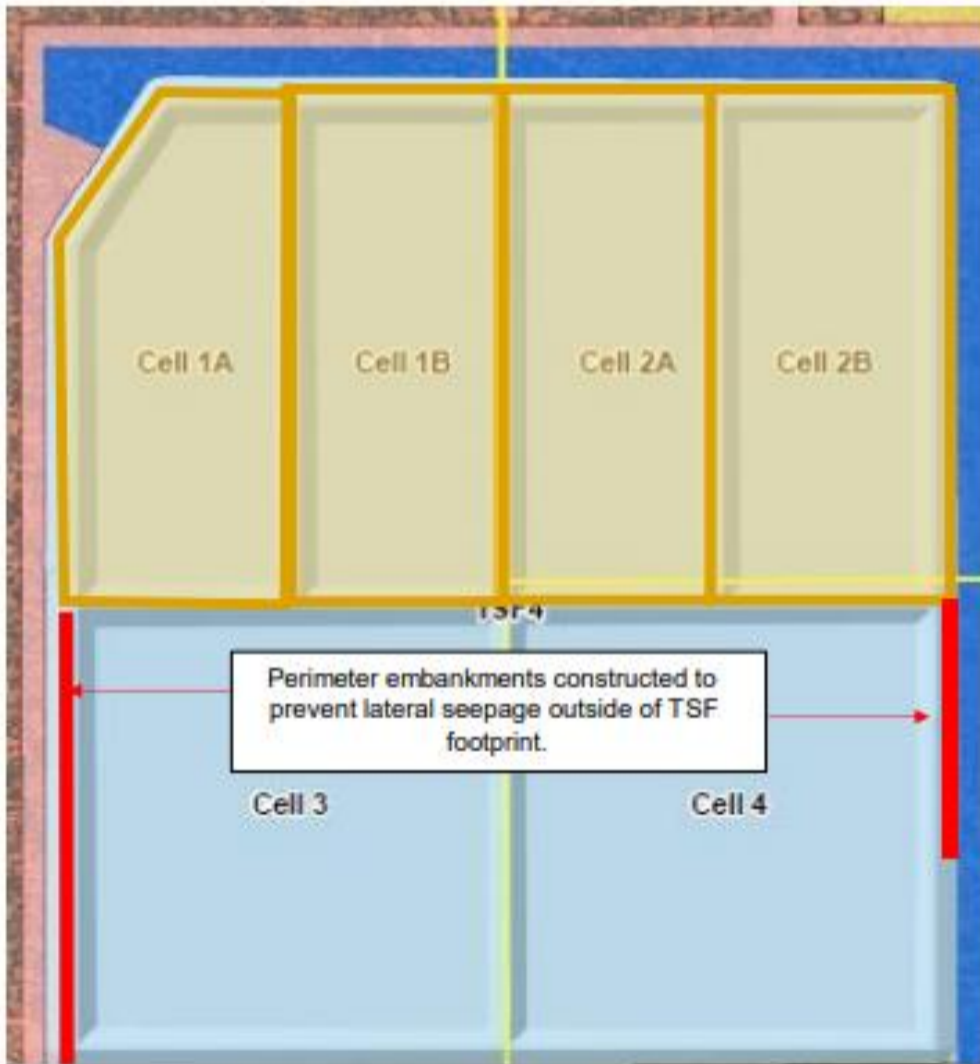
Plan showing Stage 4 of the TSF construction – Cell 1A construction
